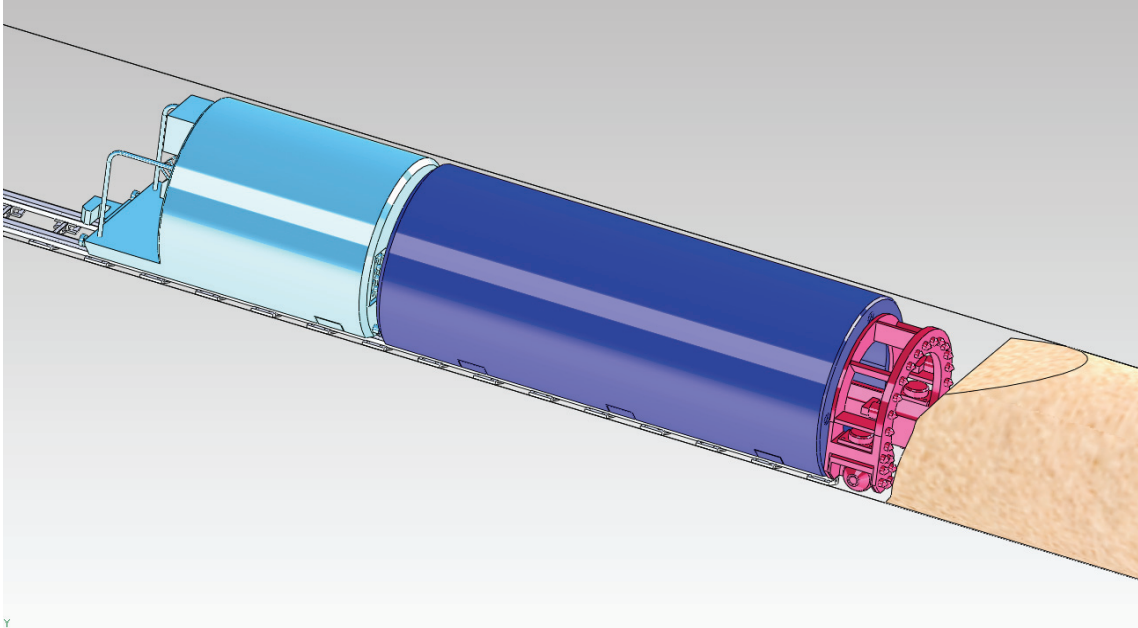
Container Retrieval Machine, with Power Module attached, is positioned to initiate the removal of tunnel backfill around the Container.
